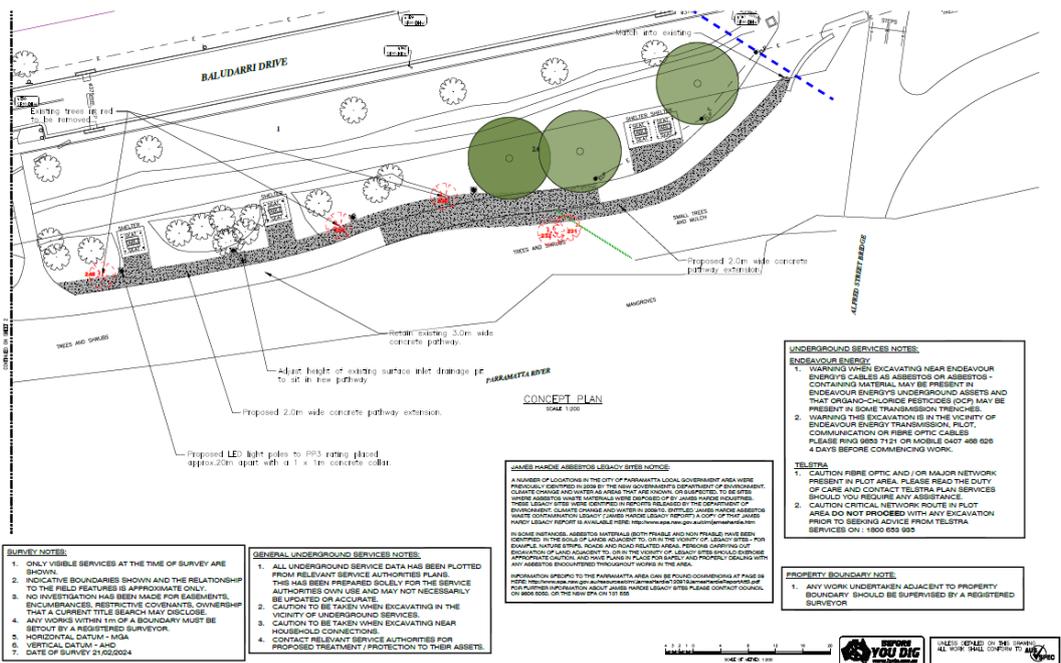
Proposed Landscape Plan (Sheet 2). Source: City of Parramatta Council
